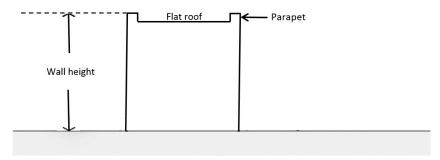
How to measure wall height for dwellings with pitched and flat roofs
